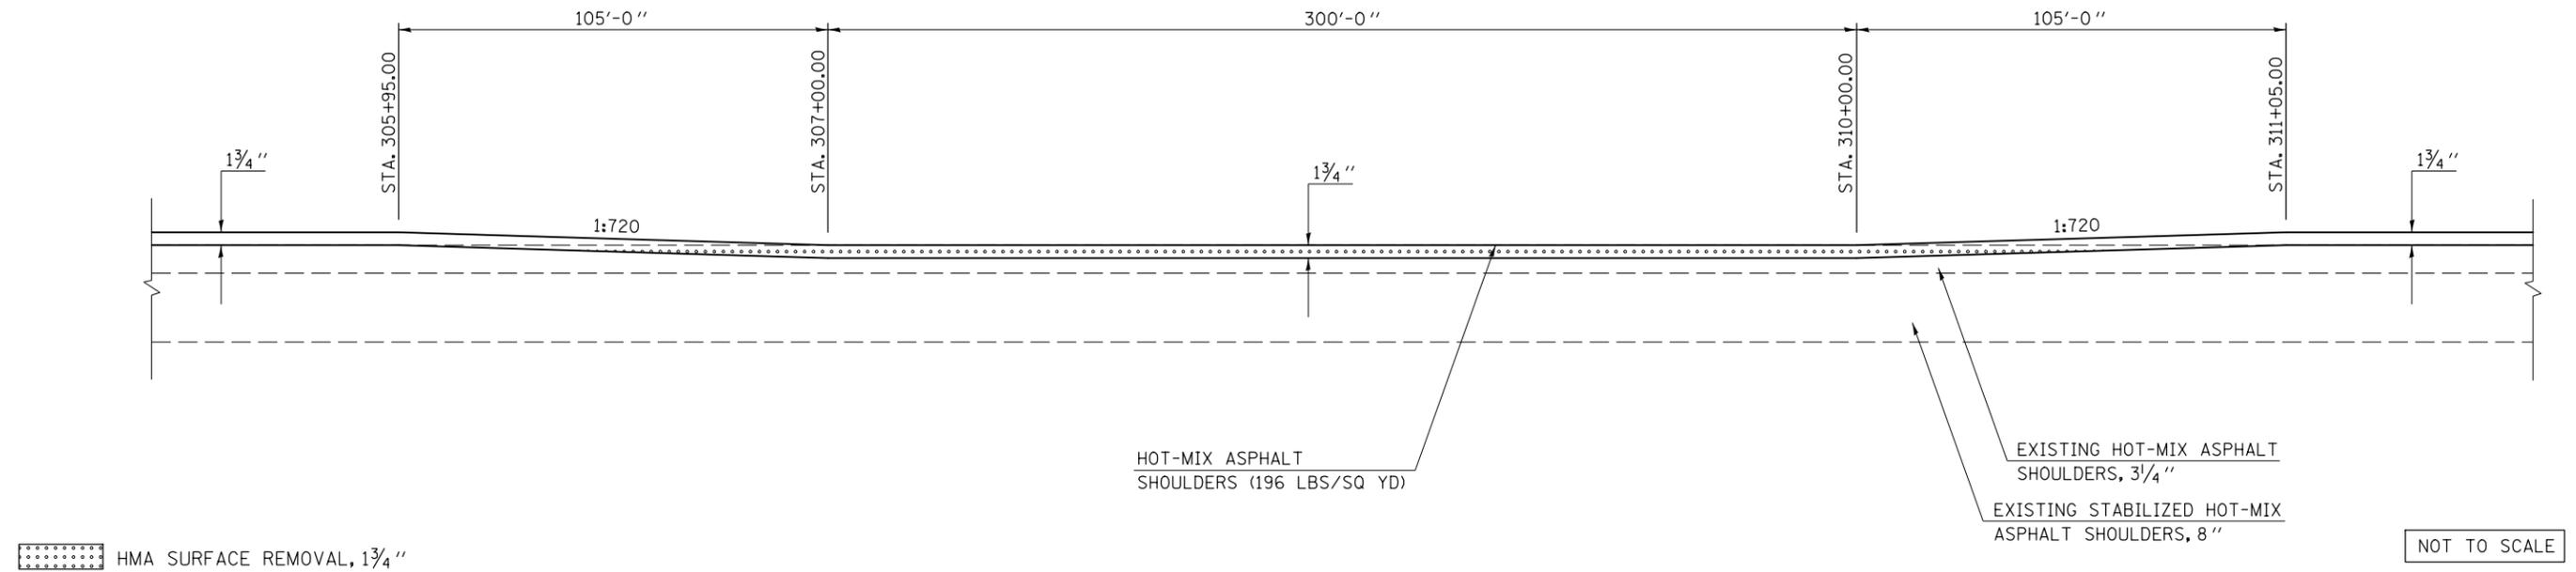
MILLING & PAVING TRANSITIONS UNDER S.N. 057-0132
